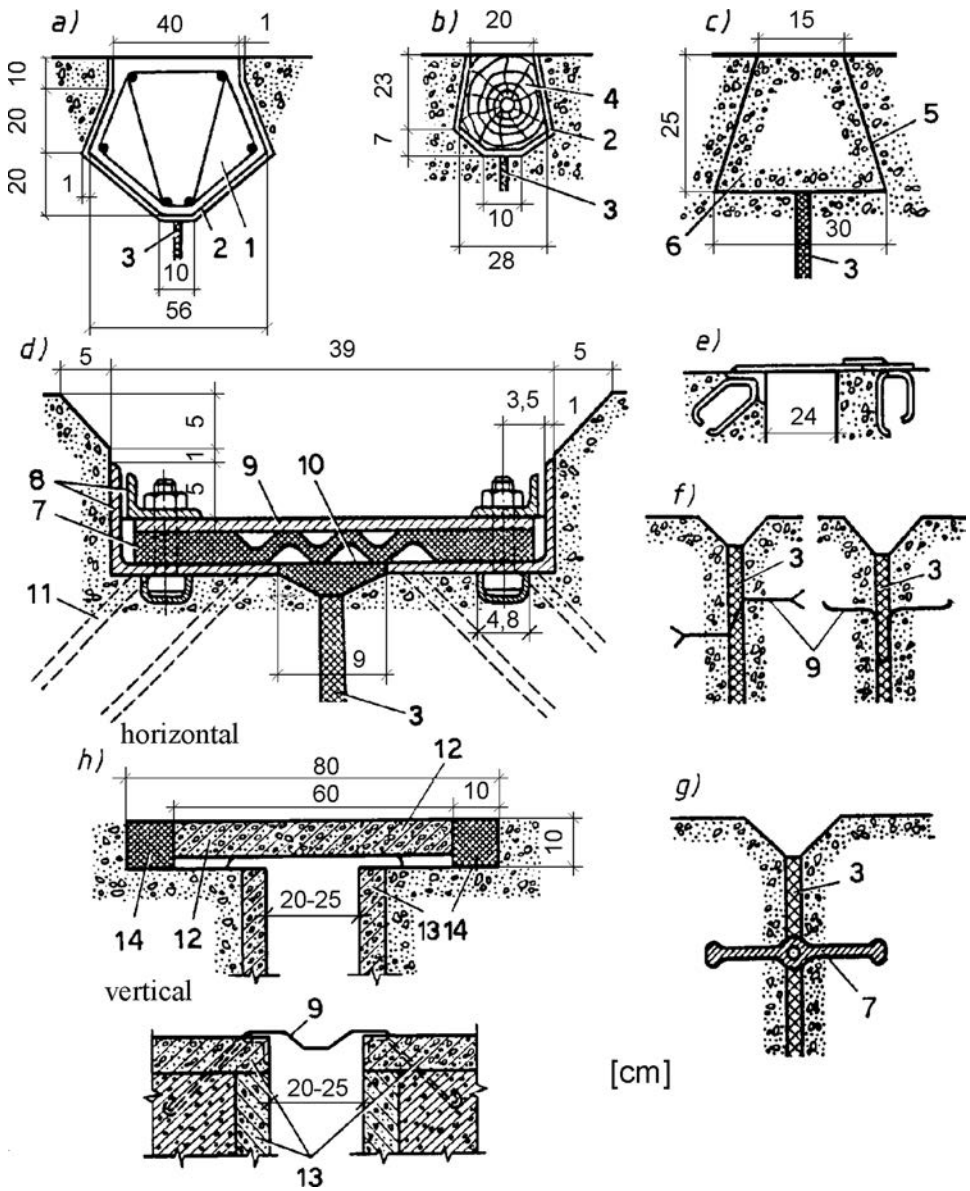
Contour basic closing of joints. (a) Reinforced concrete beam; (b) wooden beam; (c) concrete plug; (d) rubber seal; (e) steel plate; (f, g) coating on the joint surface and internal basic waterstop with metal or rubber strip; (h) contour closing in case of soil (non-rock) foundations: (1, 4) Beam; (2) bitumen; (3) joints; (5) bituminous coating; (6) plug; (7) rubber strip; (8) steel angles; (9) steel plate; (10) slag mixture; (11) anchors; (12) reinforced concrete slab; (13) lining slabs; (14) asphalt mastic.
